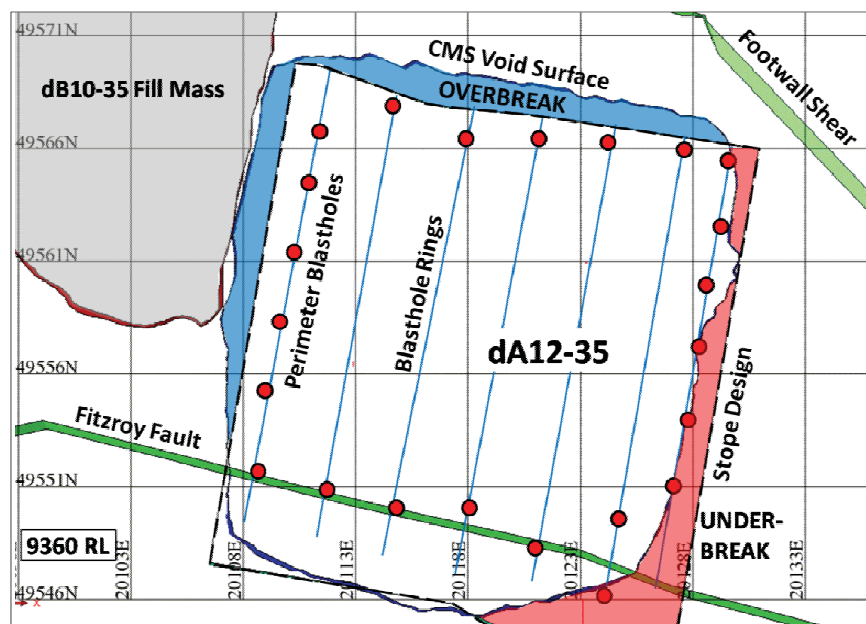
Plan view of stope dA12-35 CMS and design wireframes at 9360m elevation showing areas of overbreak (blue), underbreak (red) and perimeter blastholes.
